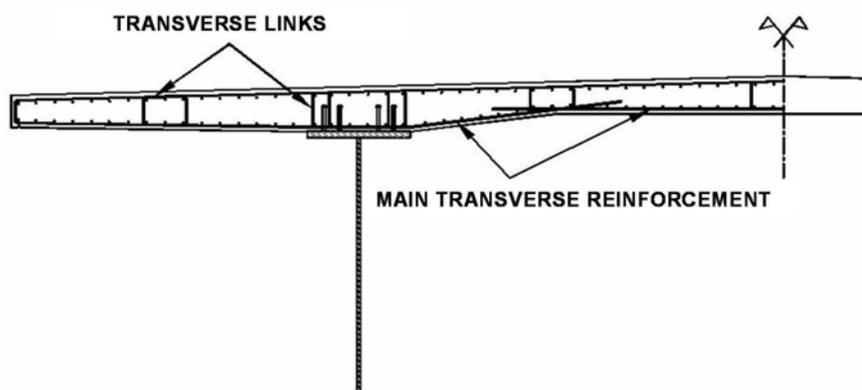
Standard slab reinforcement principle for a deck without directly supporting cross-beams (excluding restraint system anchorage)
